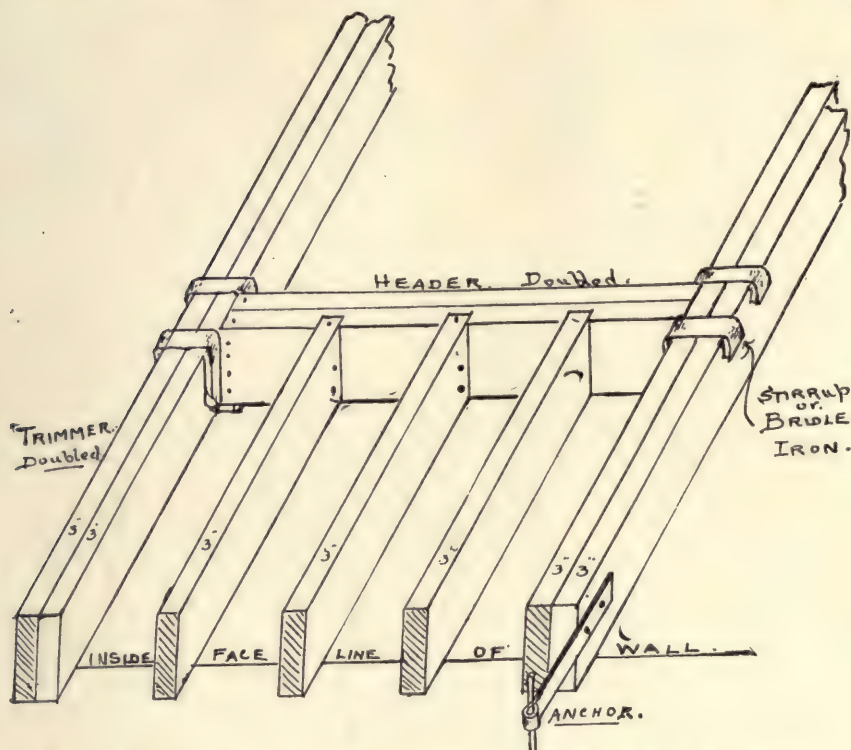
Headers and Trimmers Doubled, also Framing of Floor Beams.
